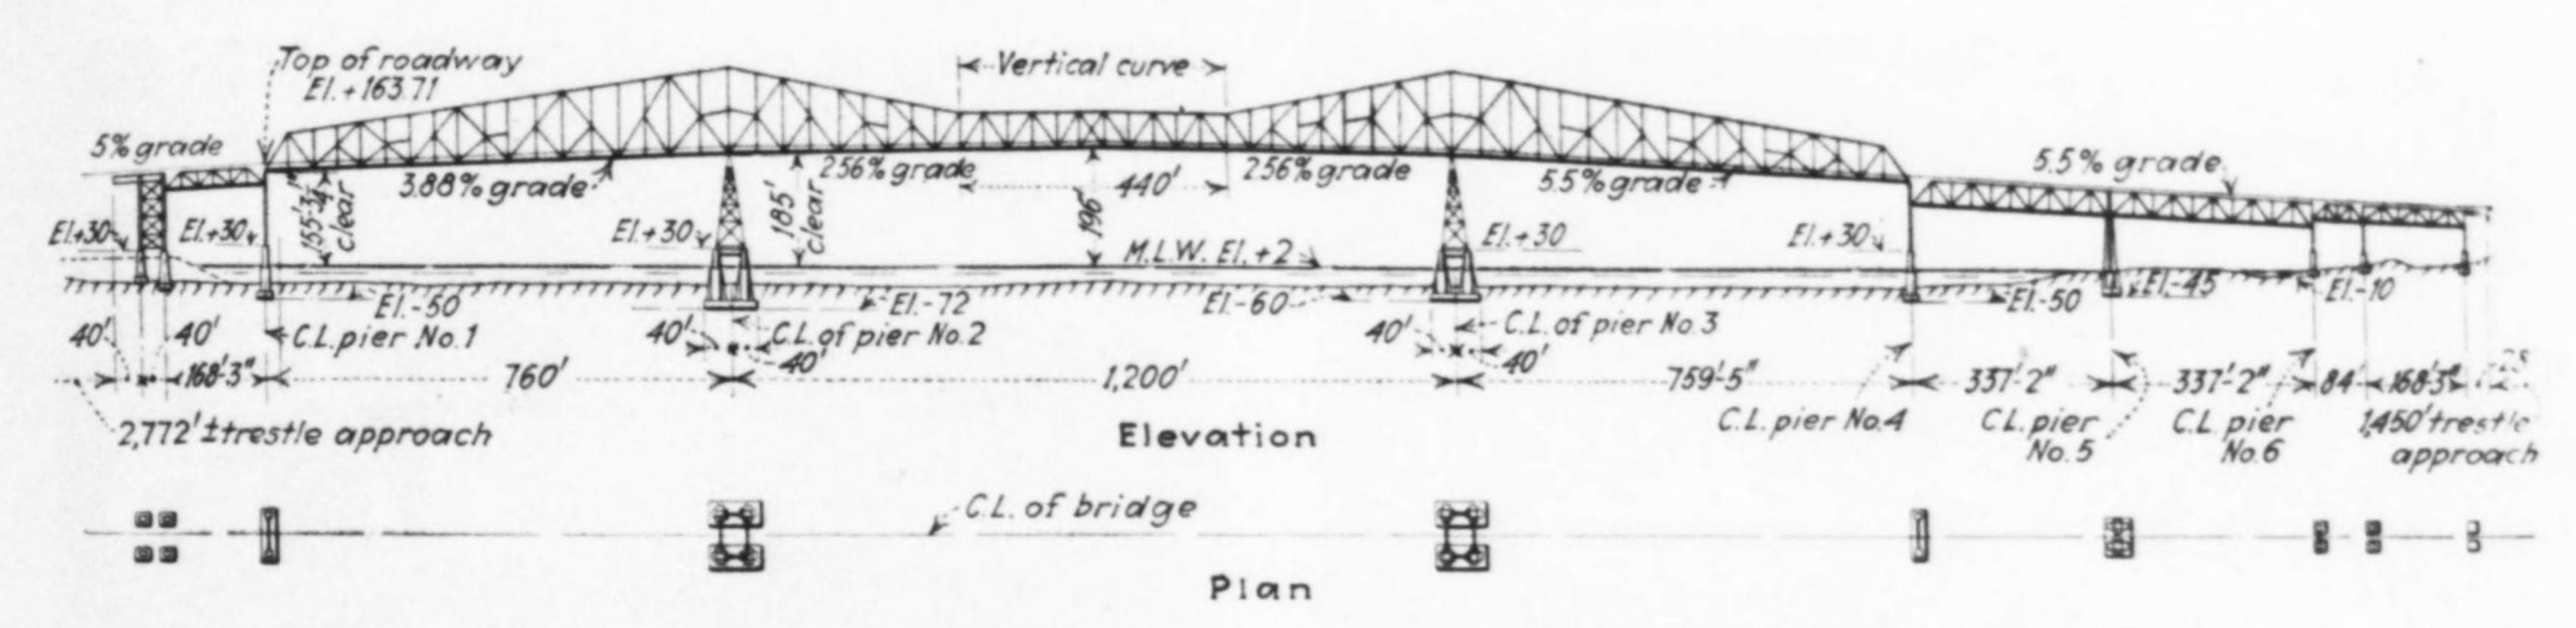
PLAN AND ELEVATION OF COLUMBIA RIVER-LONGVIEW BRIDGE
